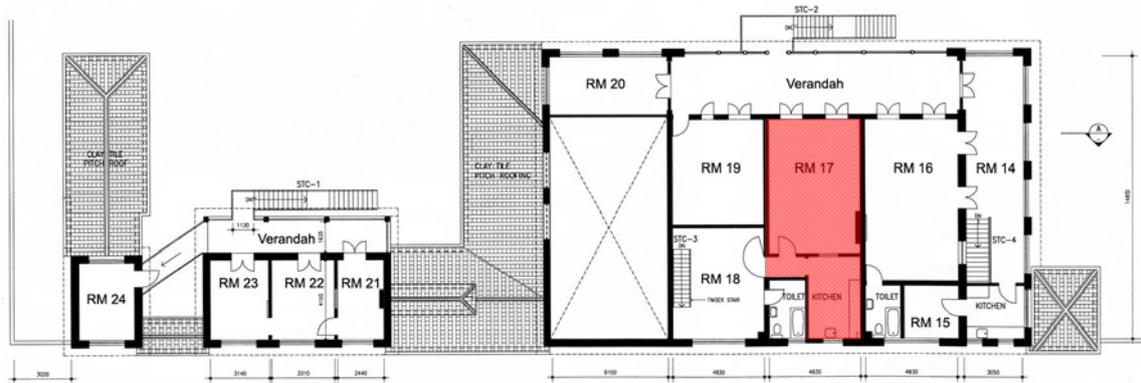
Location of RM 17 on the first floor at the former clubhouse (1:400).
